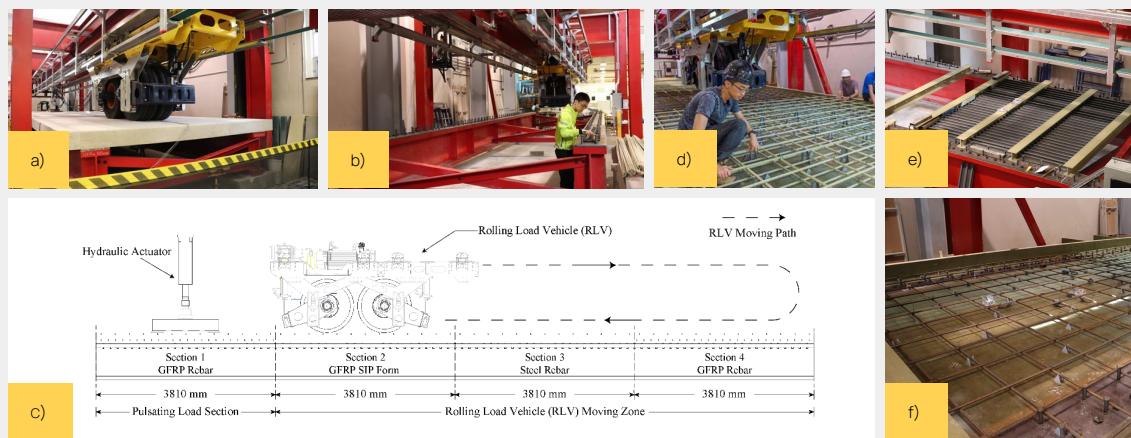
(a) Overview of bridge specimen and rolling load simulator, (b) Shear studs plate installed on steel supporting girder, (c) schematic plot of deck segmentation with label and loading setup in elevational view, and photos of (d) GFRP rebar grid, (e) GFRP SIP form, as well as (f) steel rebar grid.
